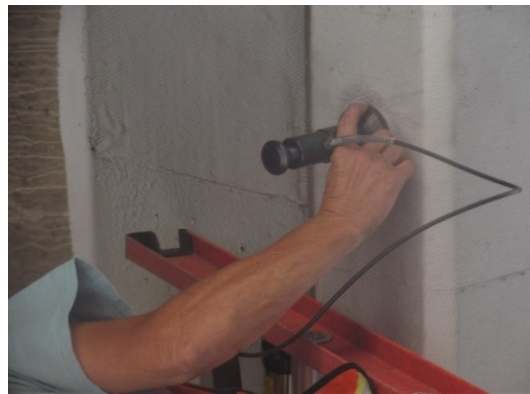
Pull-Off test on girder 4 (sample 2), Bridge 2
